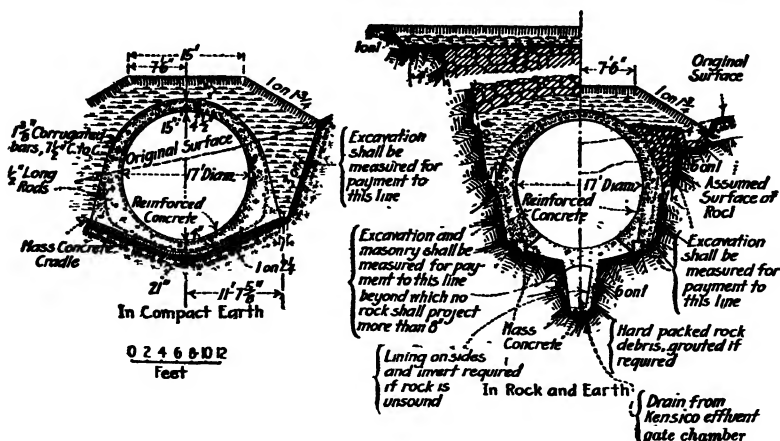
Reinforced concrete aqueduct.* Types in open cut.
